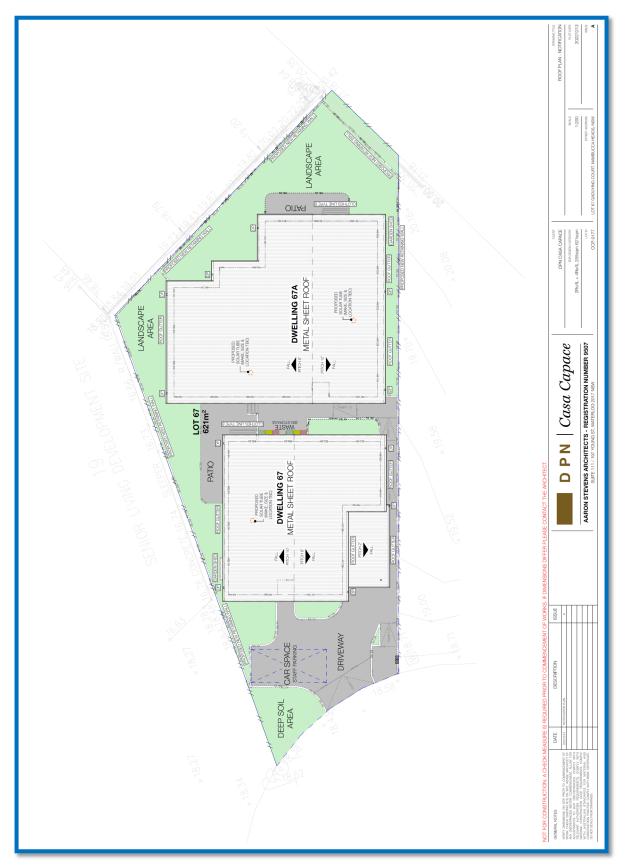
roof (site) plan (Aaron Stevens Architects, 13/12/2022)
